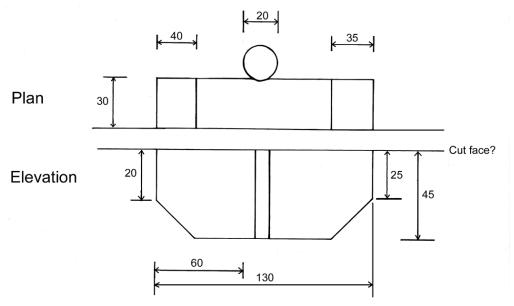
Sketch drawing of a mortise for a common floor rafter in lower joist 2 from the floor of room 134. Dimensions in millimetres.
